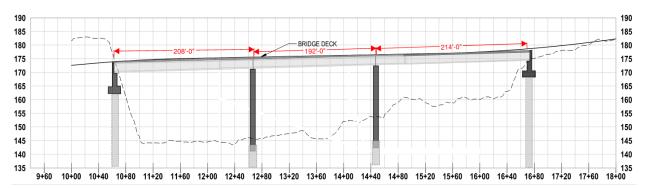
Option 6 - Three-Span Steel Girder Bridge Elevation (Spans: 208, 192, and 214 feet)
